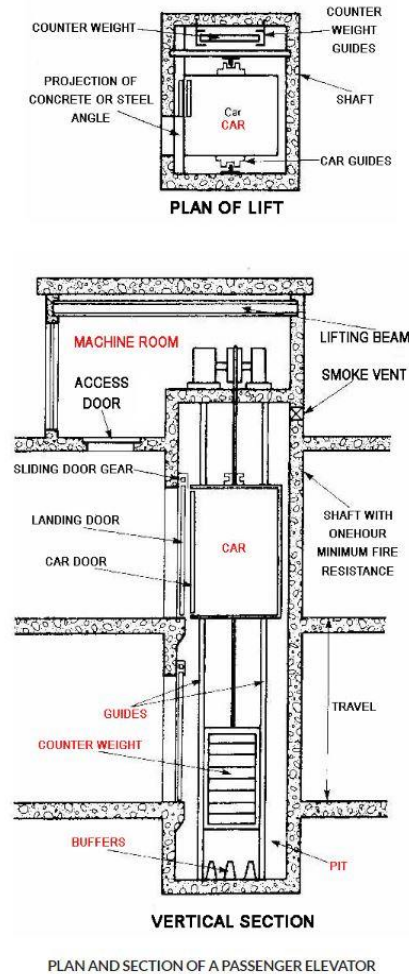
Plan and section of a passenger elevator (source: archi-monarch.com)
